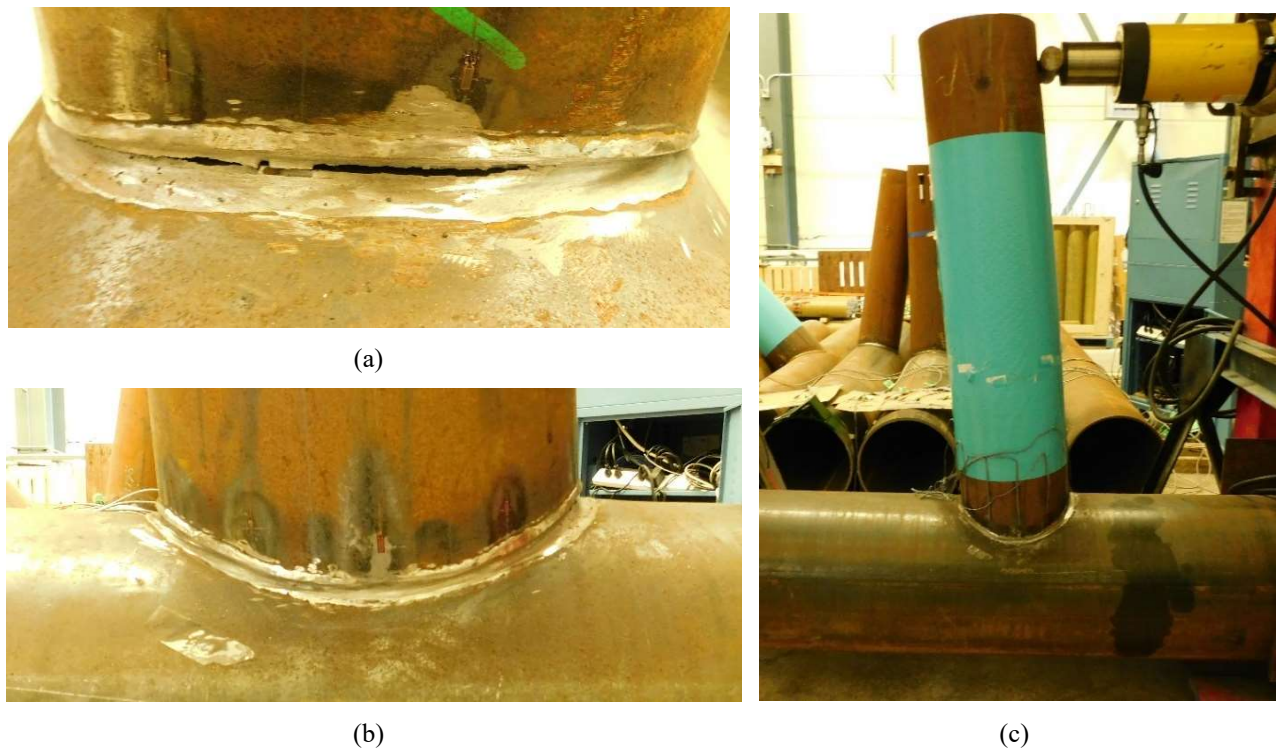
Failure of T406-273-1P (a) weld fracture, (b) chord deformation and (c) branch deformation
